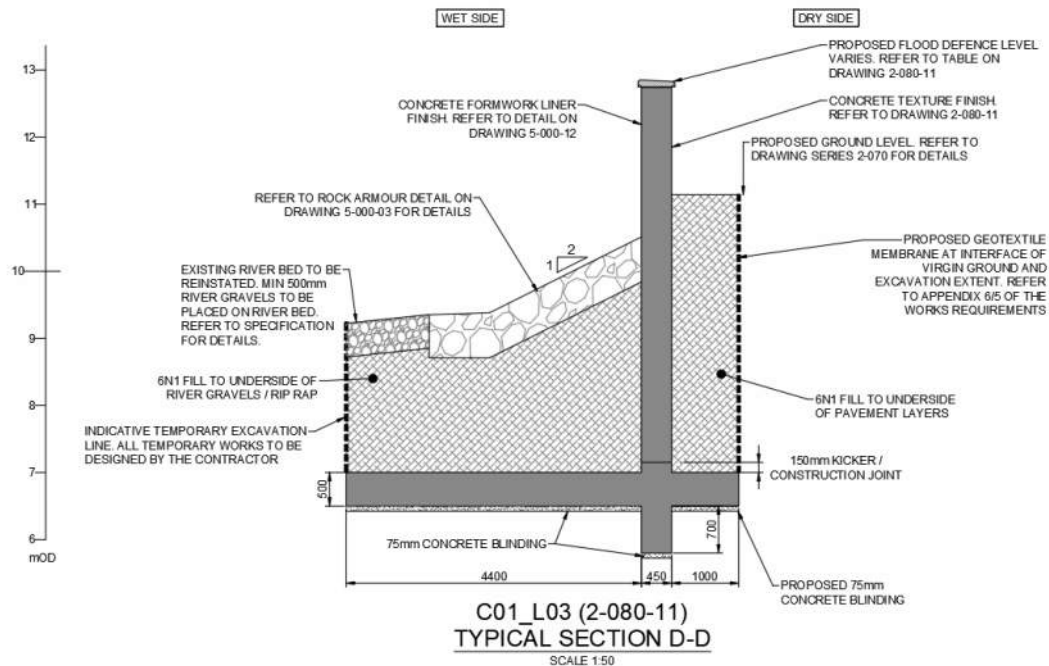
Proposed Cross Section of Flood Defence Wall (C01_L03)
